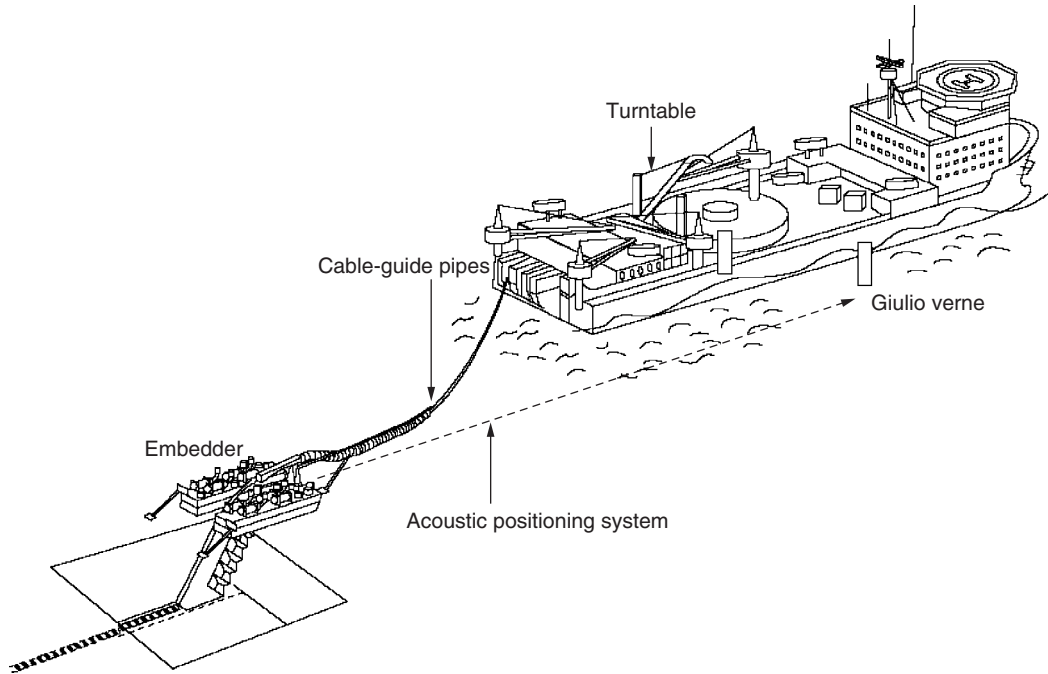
Cable laying ship and sea bottom embedder. (Courtesy of Prysmian.)
